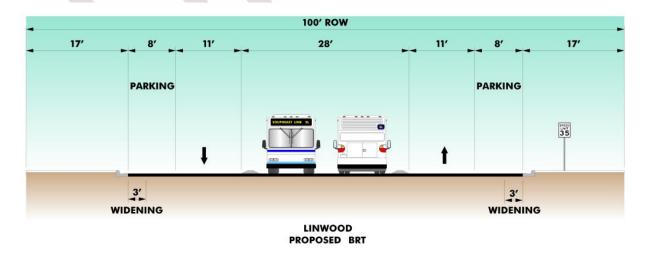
Bus Rapid Transit Linwood Blvd Typical Section
